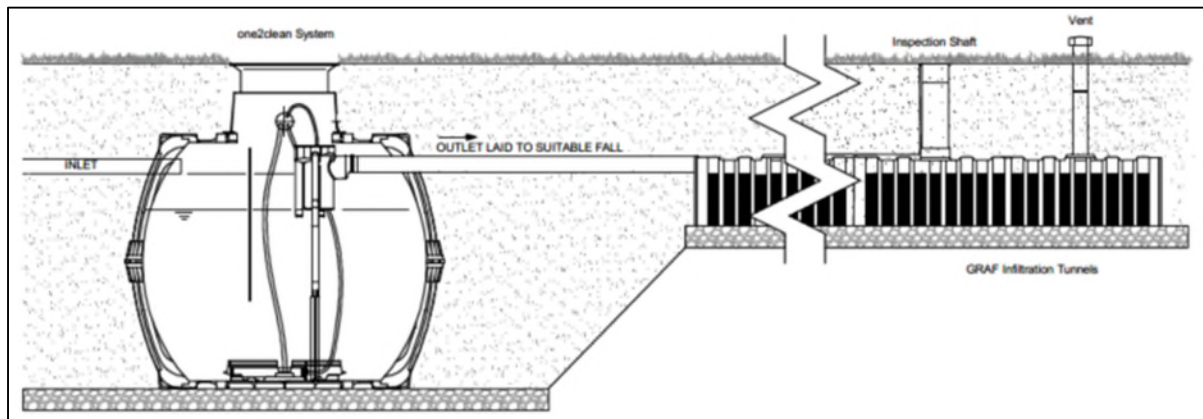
GRAF One2Clean Sewage Treatment Tank and Drainage Tunnel
